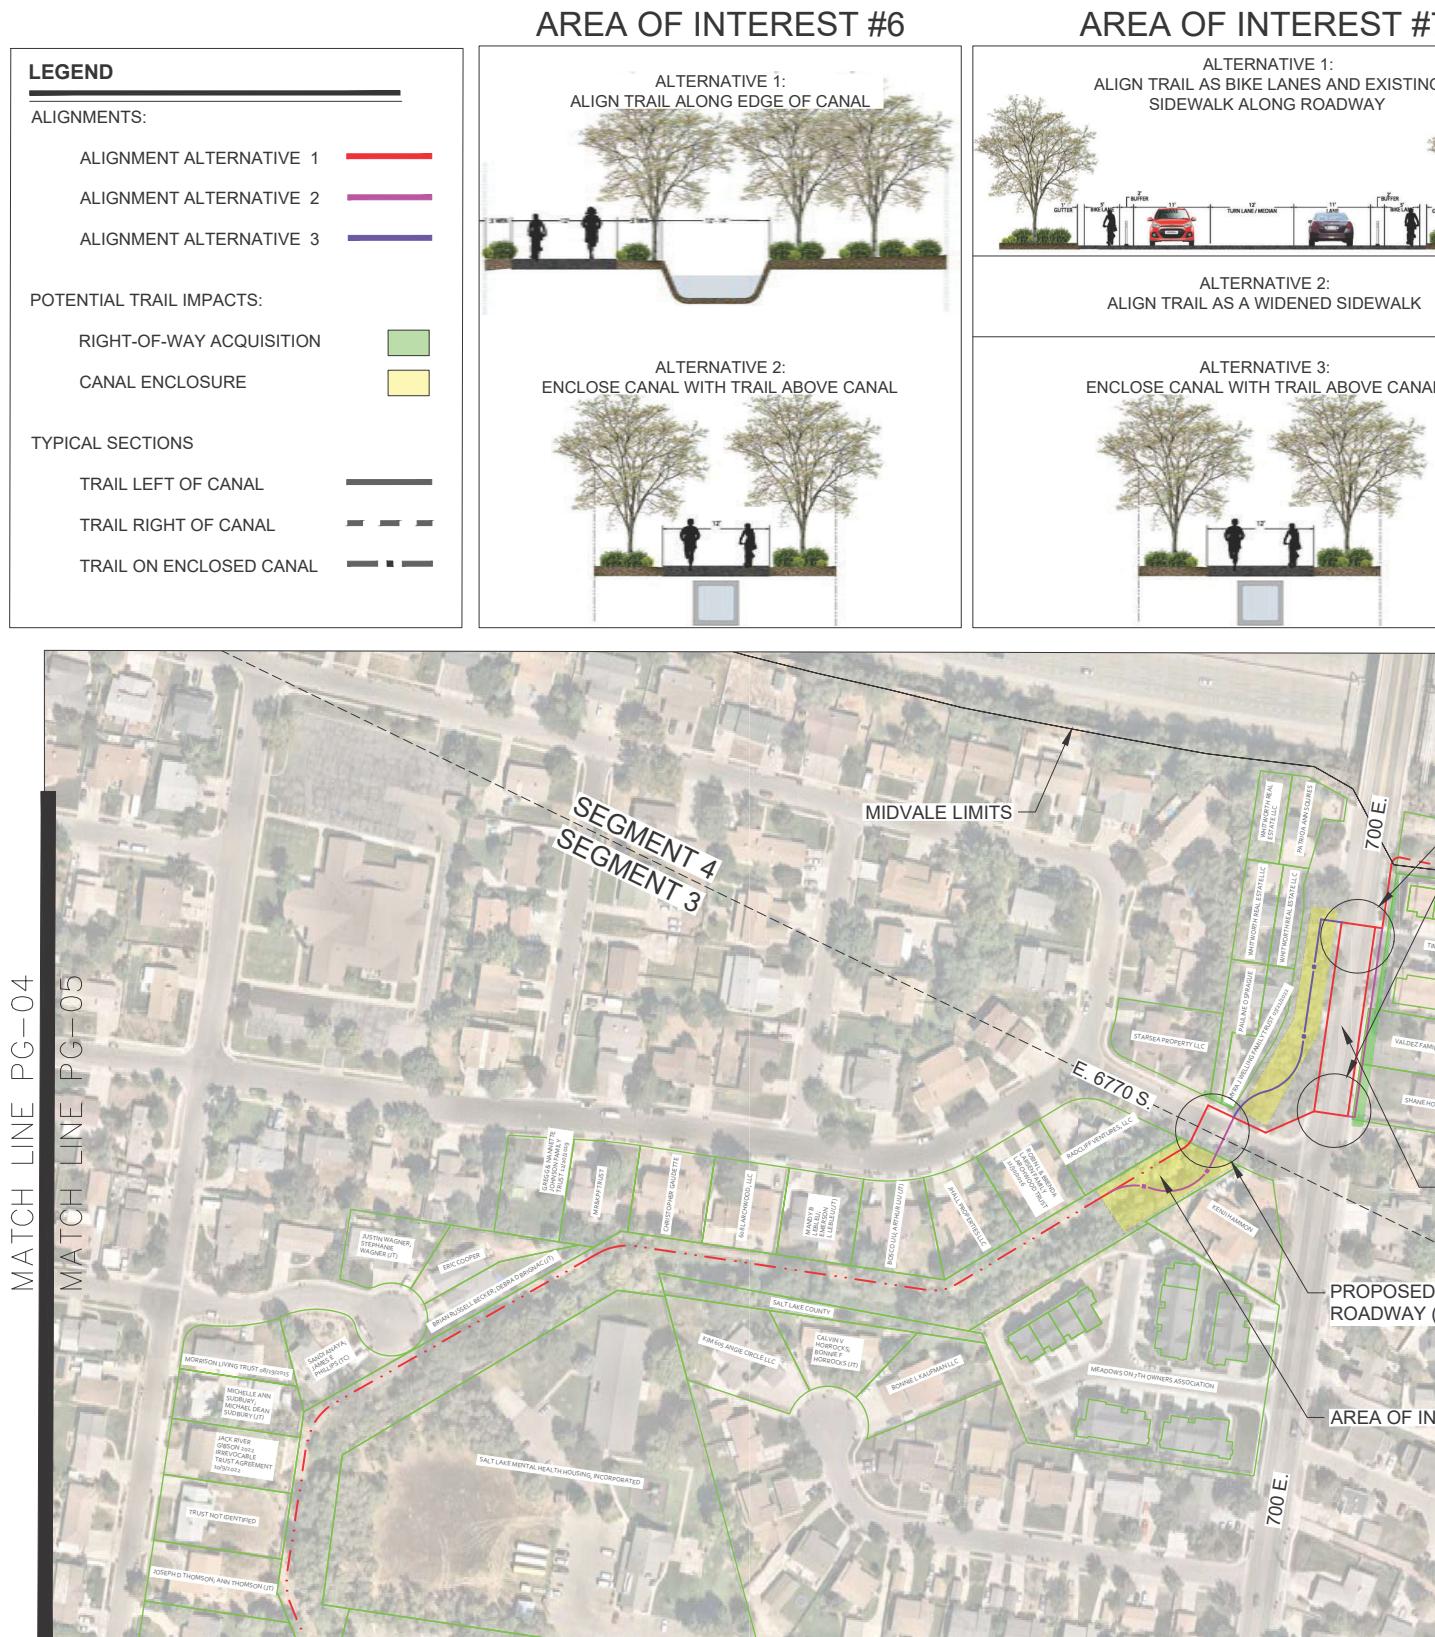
Proposed alignment along the Jordan and Salt Lake City Canal, sheet 5.
